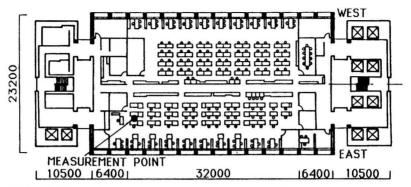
Plan (ninth floor). It is similar to the sixth floor except that the ninth floor is not divided by partitions.
